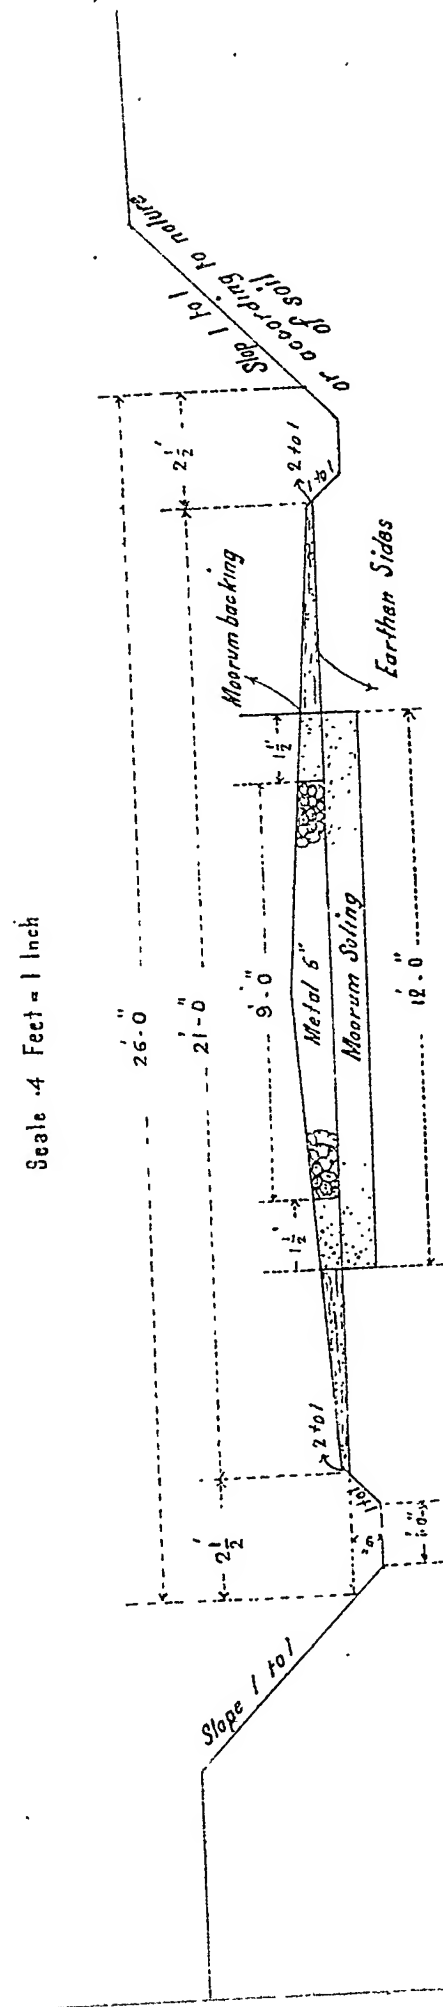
DETAILED TYPE CROSS SECTION OF ROAD IN EMBANKMENT
